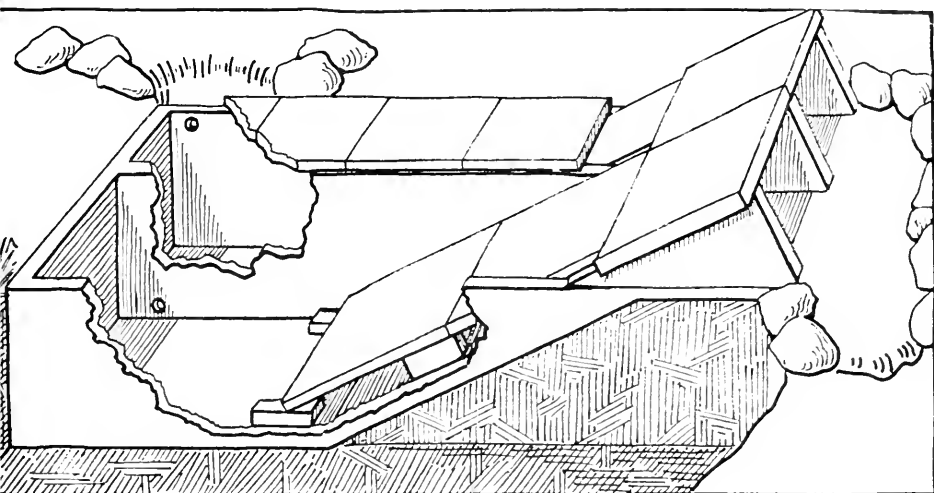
Cutaway of "Gallinaceous Guzzler." This shows the details of construction of the "Gallinaceous Guzzler." All construction is of concrete. The underground tank holds about 750 gallons of water. Concrete roof and baffle slabs retard summer evaporation. The rain collecting apron is made of concrete covered with asphalt emulsion; the size of the apron is calculated on the basis of the minimum recorded rainfall for the area in which the "Guzzler" is installed.
